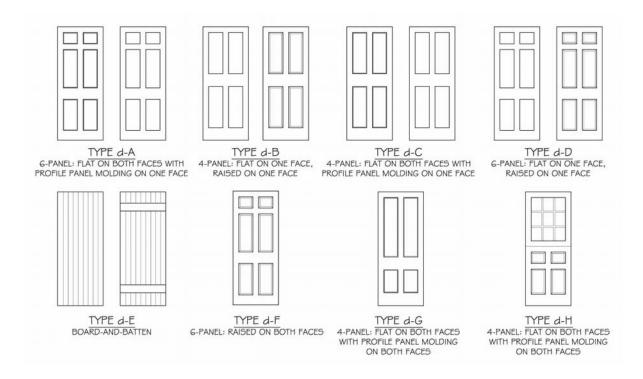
A-8. John Nelson House Existing Door Types (not to scale).
